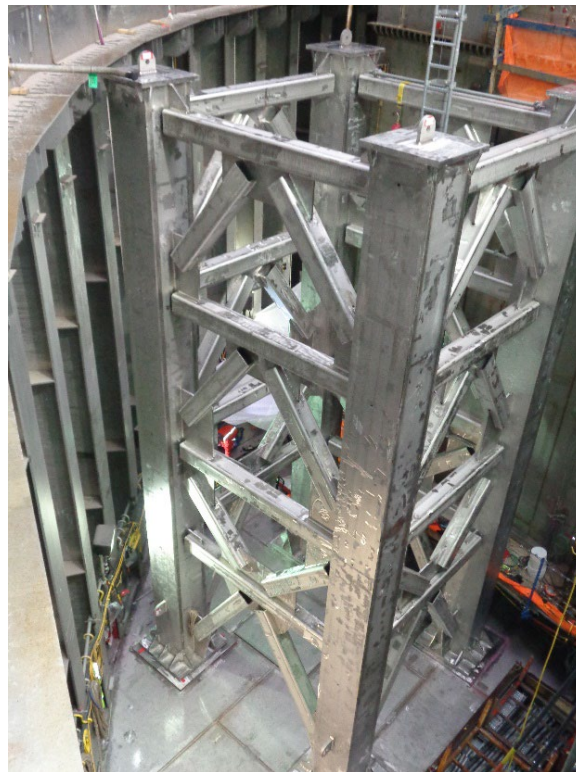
Stainless steel support tower at the Vogtle Nuclear Power Plant Units 3 & 4.
